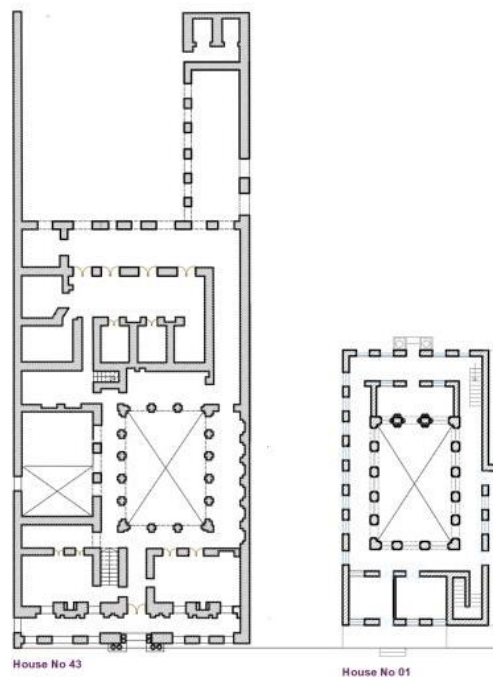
Central Hall Type Building (House No 01 and 43). (Source - Author, 2021)
